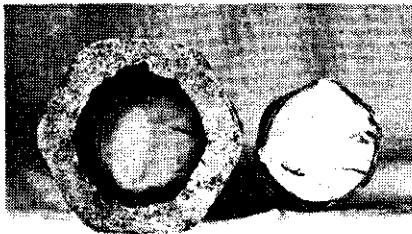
Fracture surface of TS-type Sleeve Joint (TS276)
